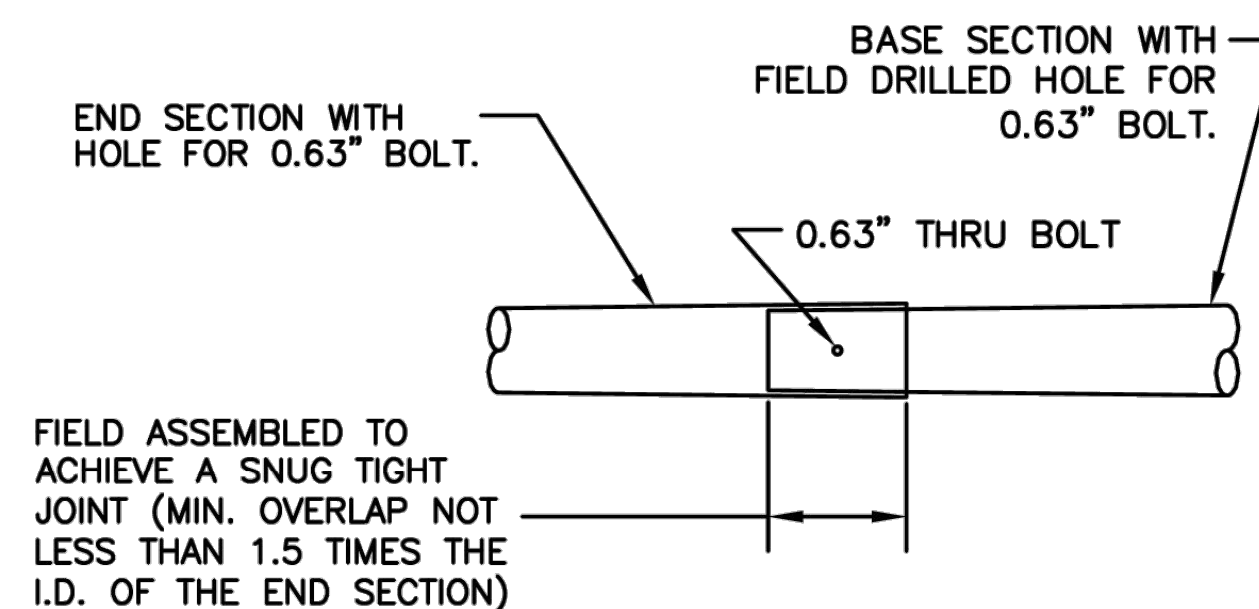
LUMINAIRE ARM ATTACHMENT
